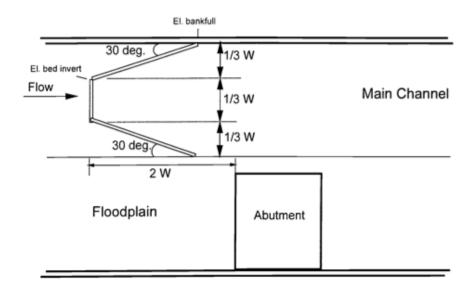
Cross-Vane Placed 2 Channel Widths Upstream of Bridge Abutment (Johnson et al., 2002).
